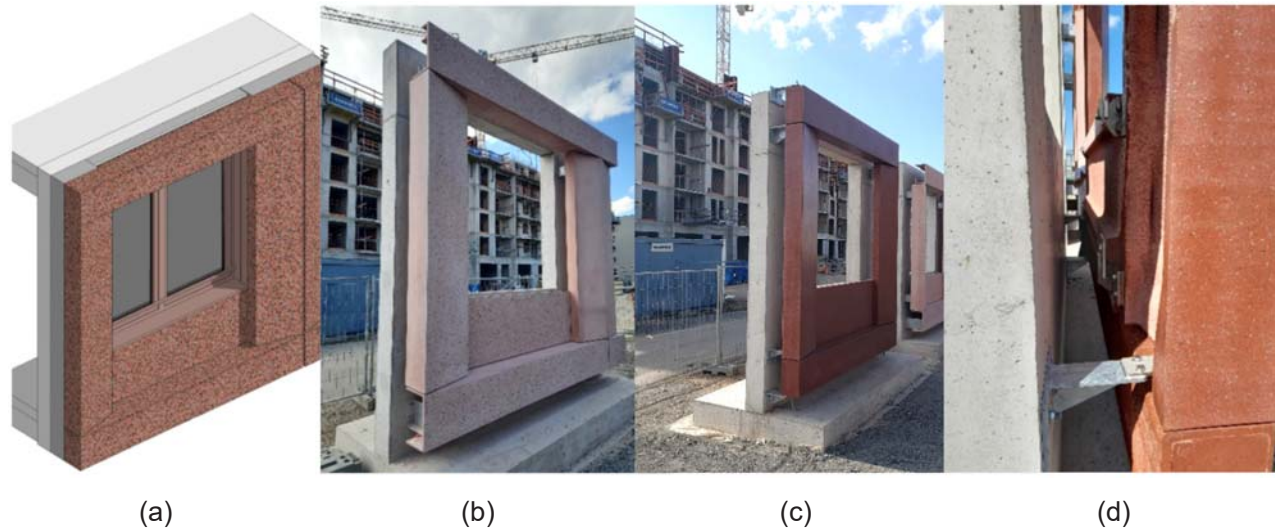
The installed mockup of pabsade panel on site: a) 3D render; b) Sprayed concrete specimen; c) 3D printed specimen; d) detail of anchoring to the panel
